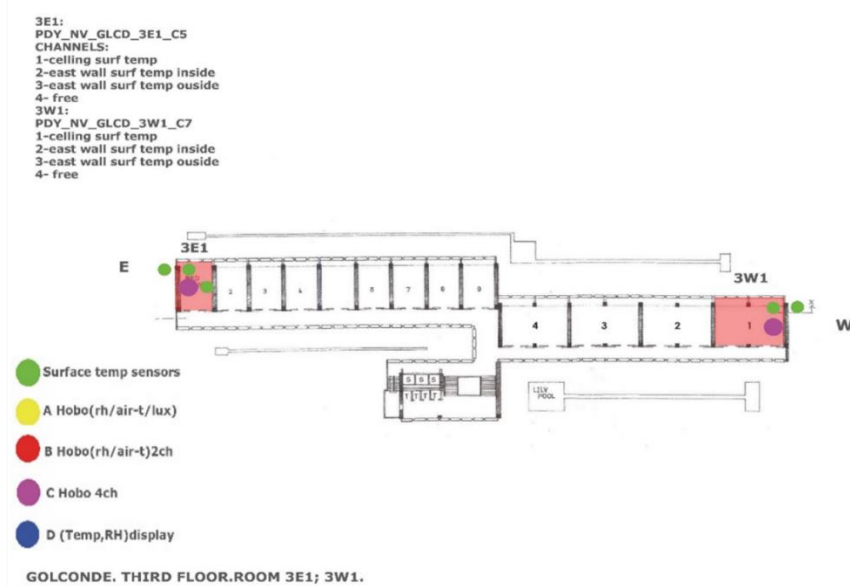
Placement of loggers on the Third Floor - Floor Plan
